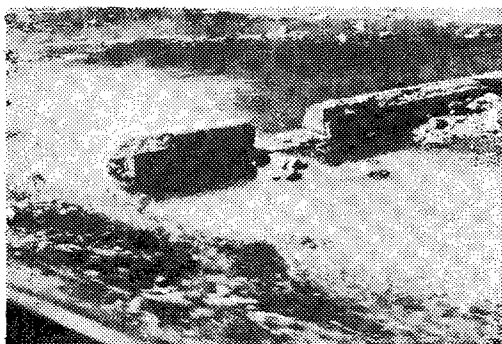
The feature of the expansion and construction joints and the connecting point of weir and bank destroyed
